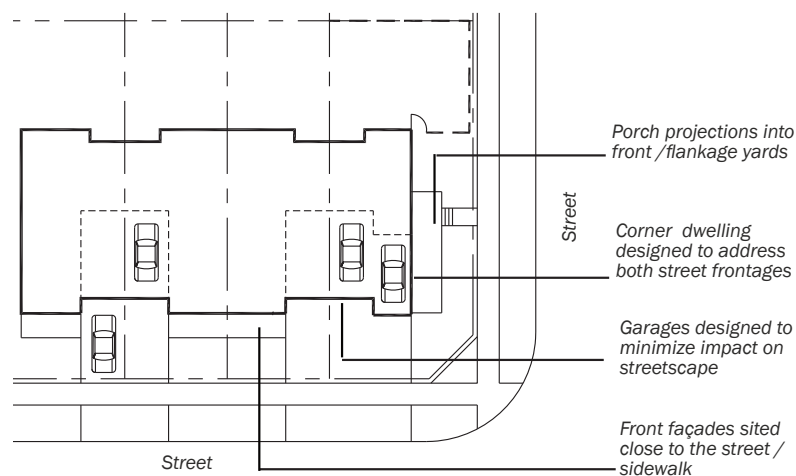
Conceptual plan layout for Street Townhouses
